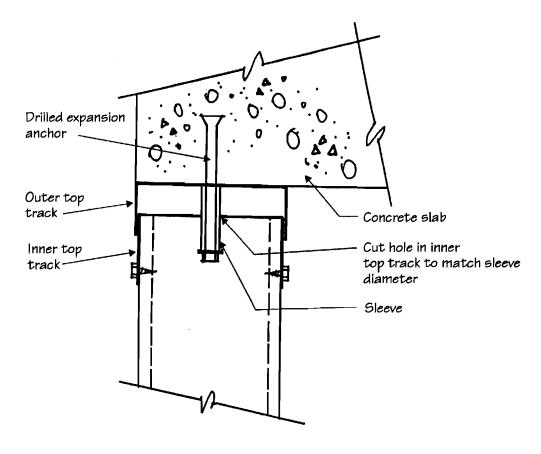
20 OUTER TOP TRACK EXPANSION ANCHOR RETROFIT DETAIL
